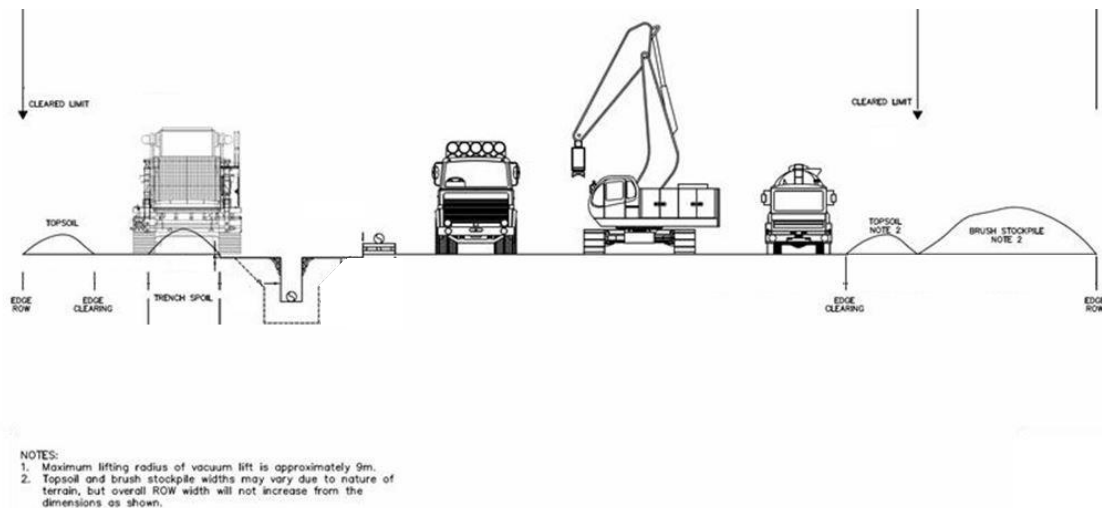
Typical Construction ROW Cross-Sectional Layout (EcOz 2016c: Figure 2-17)
